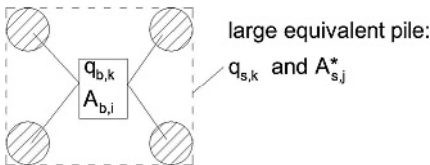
Example for applying the resisting components of a pile group as a large, equivalent pile, plan view
